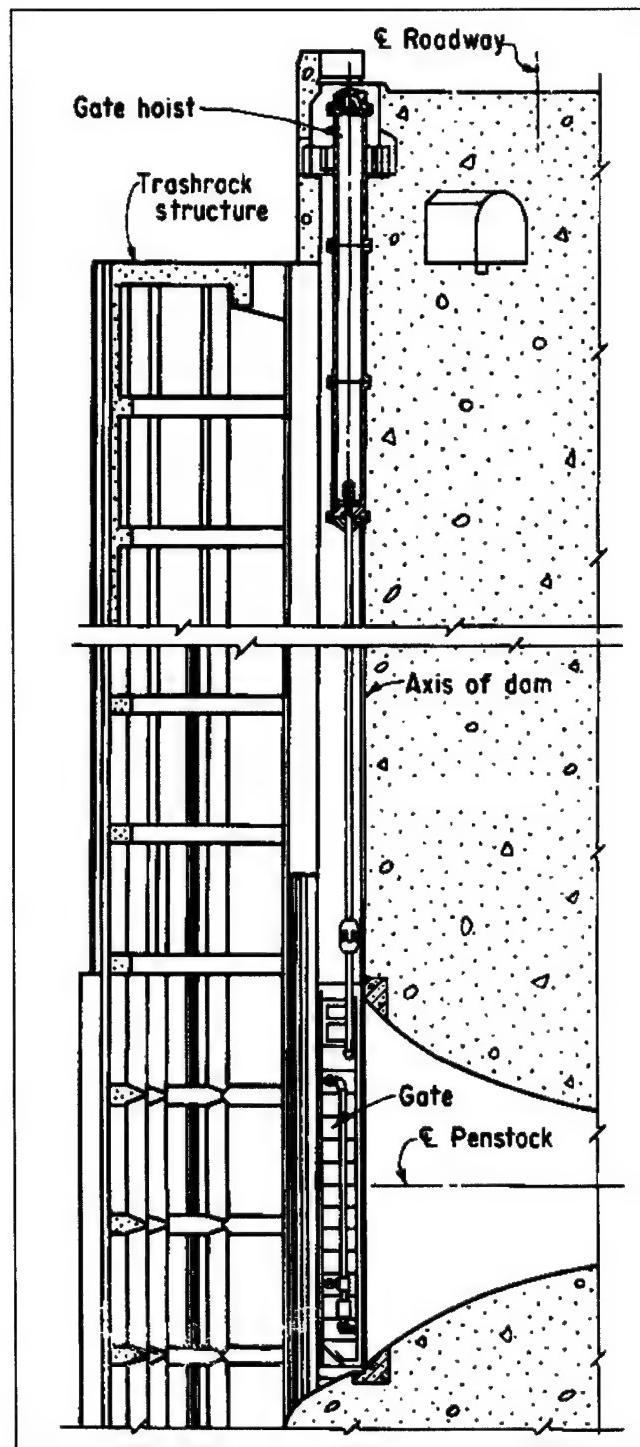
Typical fixed wheel gate installation at upstream face of dam (USBR)
